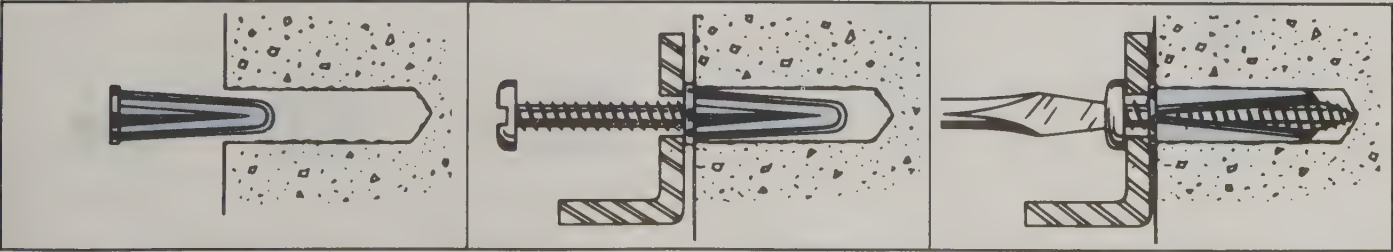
Plastic screw anchor is inserted in drilled hole. It is expanded and wedged against sides of hole as screw is tightened. (Star Expansion Company)
